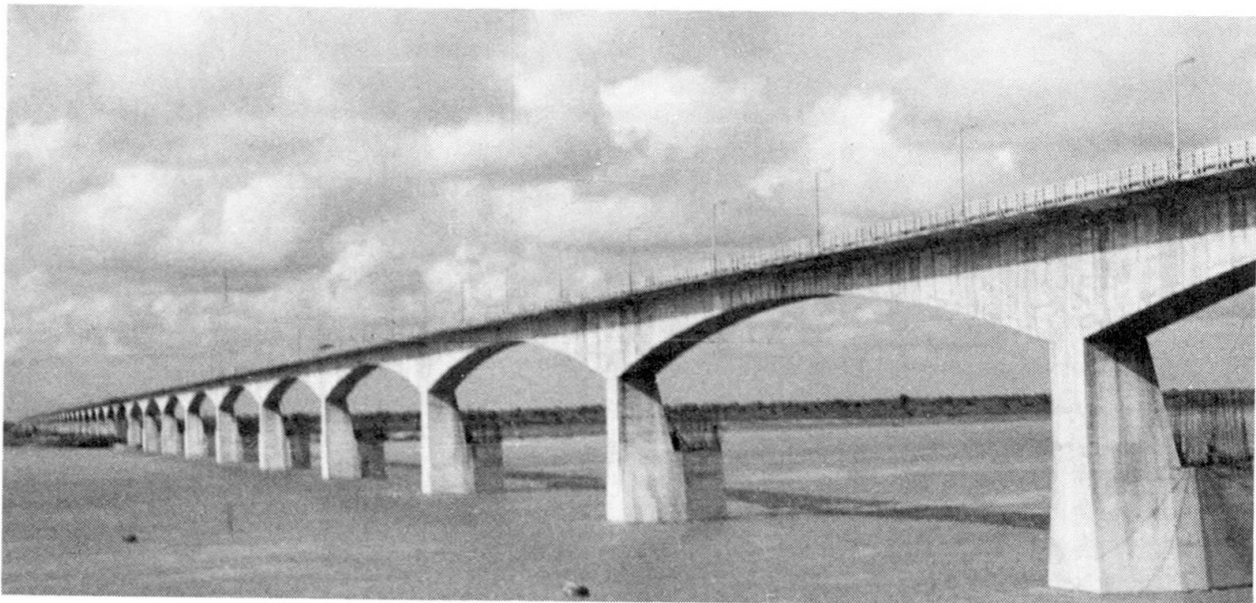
A View of the Completed Bridge (First Two Lanes)
